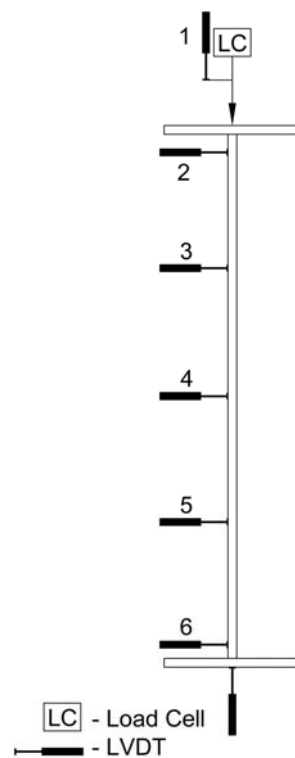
Studs S2 to S4 LVDT and load cell locations
